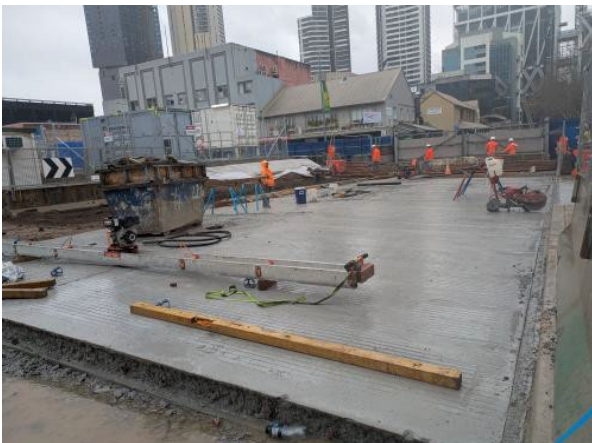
Parramatta Site: Gate 1 Concrete slab poured for haul road.
